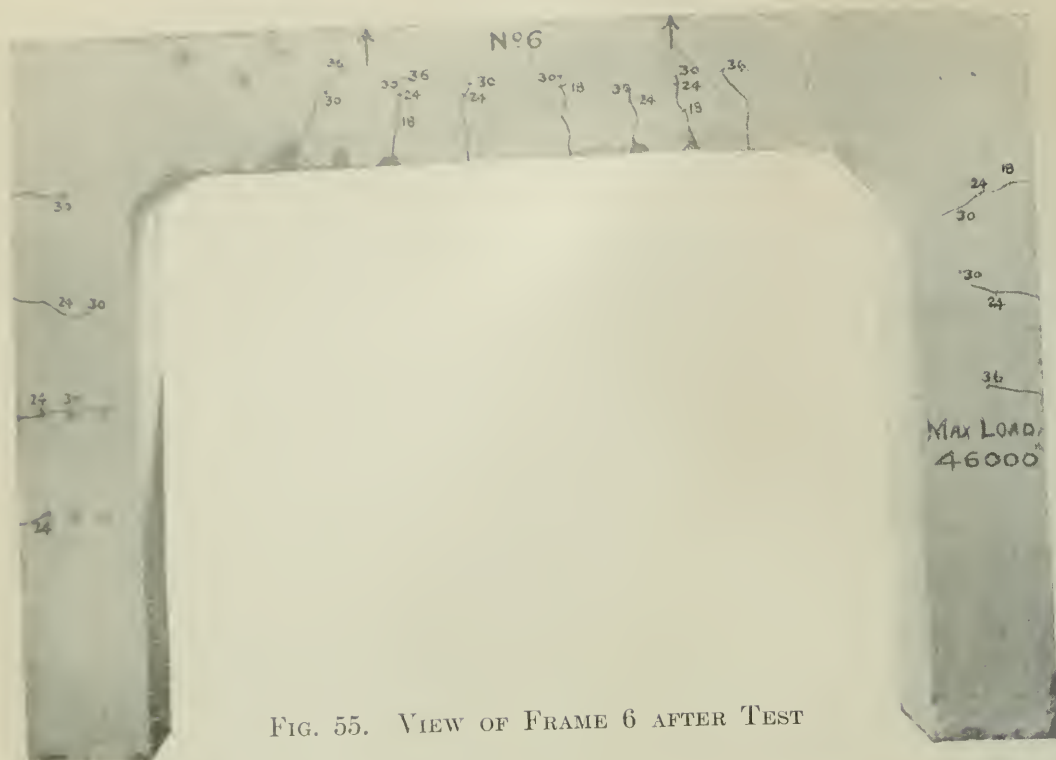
VIEW OF FRAME 6 AFTER TEST
